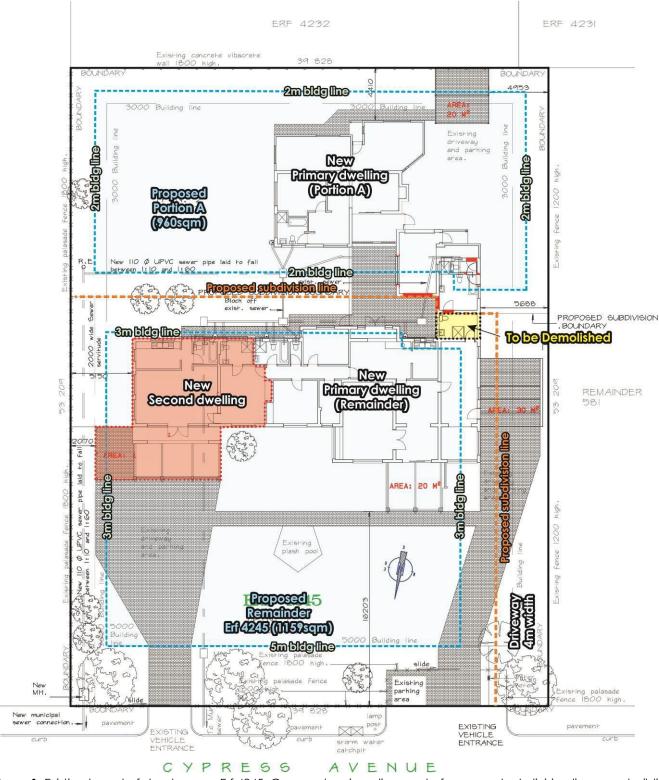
Existing layout of structures on Erf 4245, George showing alignment of proposed subdivision line, new building lines, footprint of new second dwelling on proposed Remainder and portion of structure proposed to be demolished.
